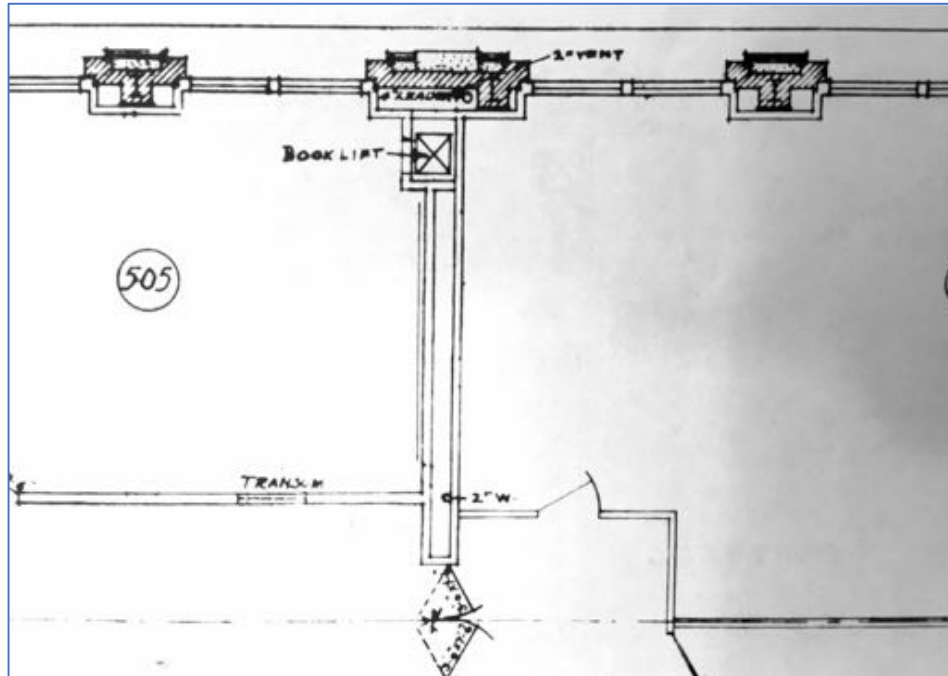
The book lifts in Avery Hall, detail from first floor plan. From the Avery Hall Collection, Avery Archives, Columbia University.
